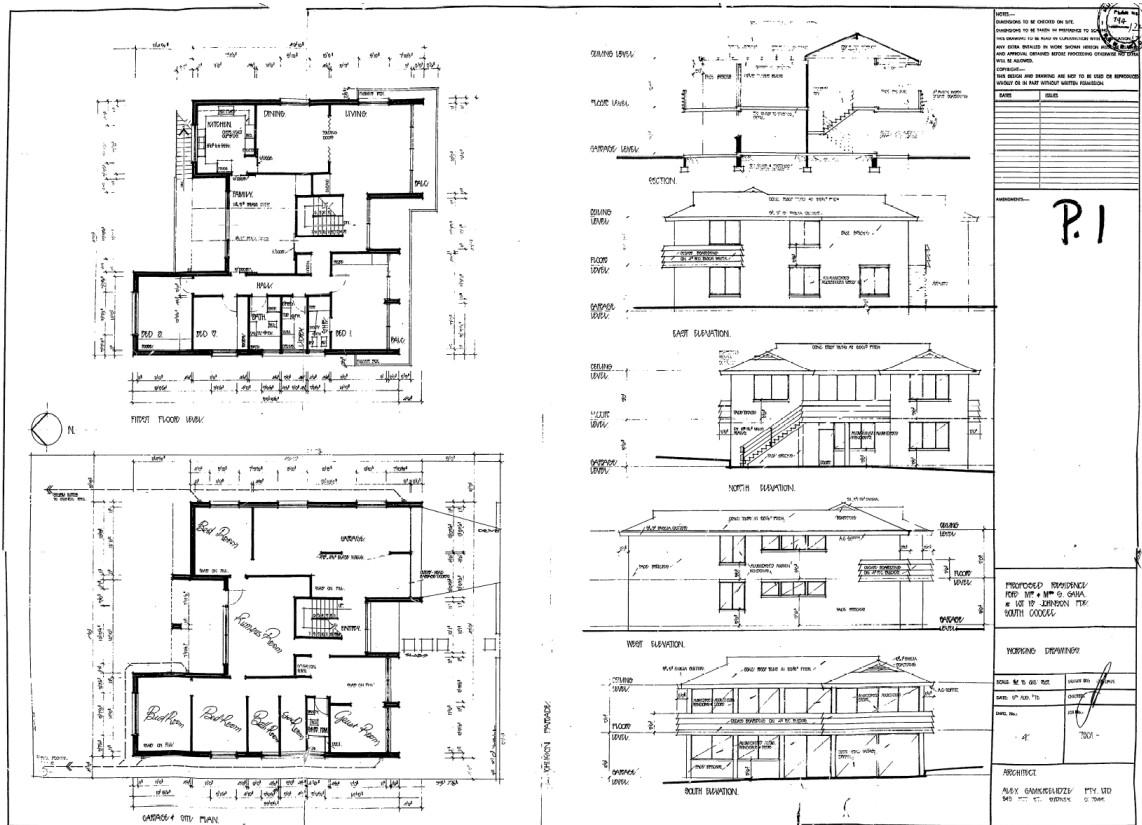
Approved plans under BA/794/1972 (Approved on 1 Jan 1972)
